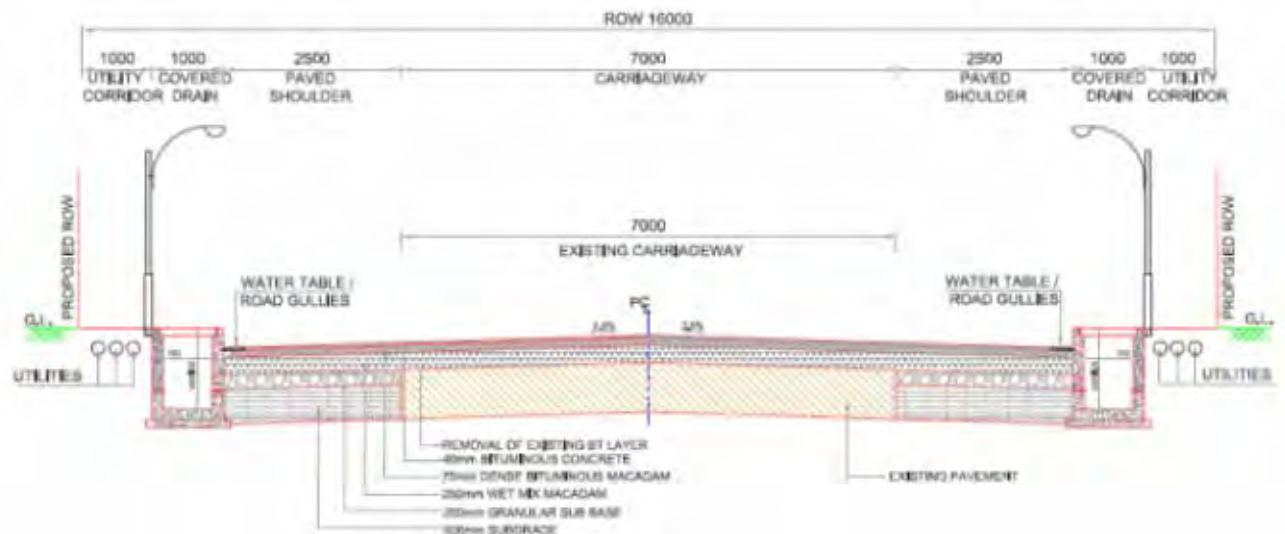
C5 –V-P- Two Lane Carriageway with Paved Shoulder in Village Area
